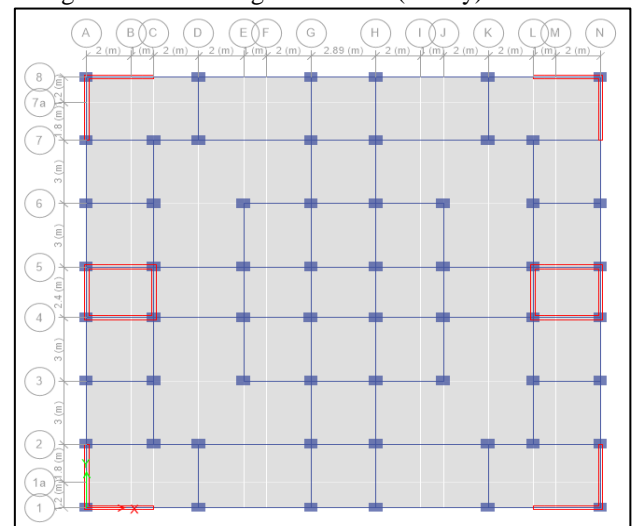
Plan Showing 11th Floor Level (Storey) In ETABS
